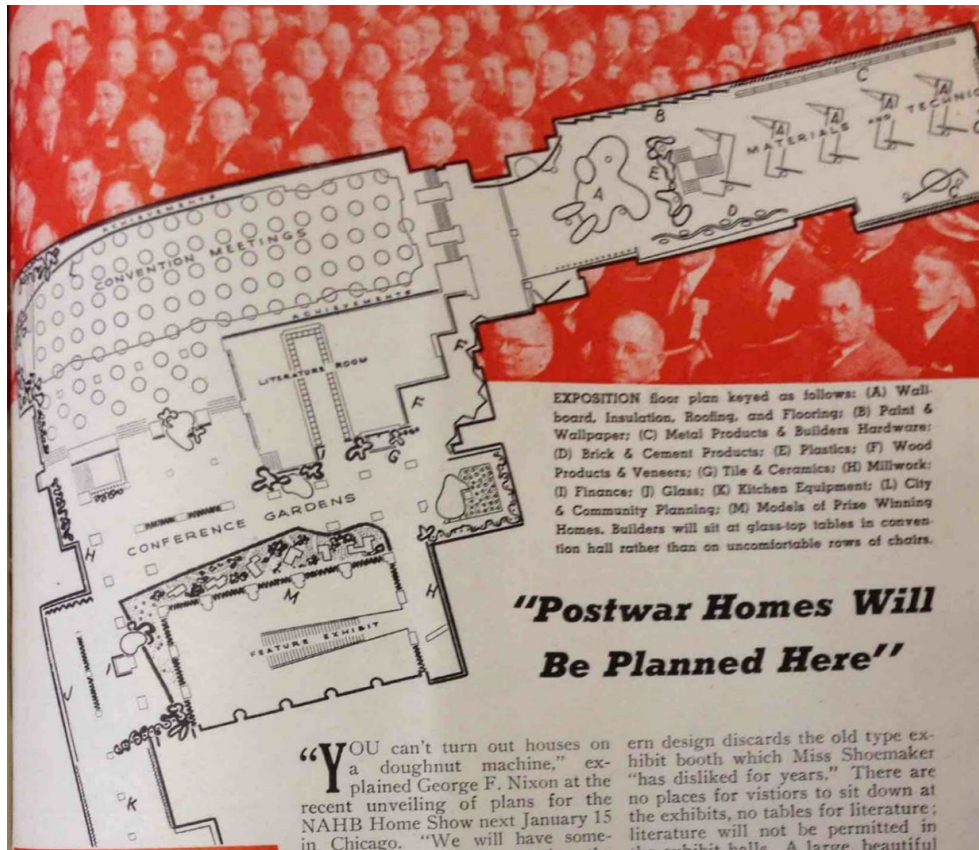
Plan of first NAHB Convention at the Sherman Hotel, Chicago, January 15, 1945. Source: *American Builder*, September 1944, page 57.
